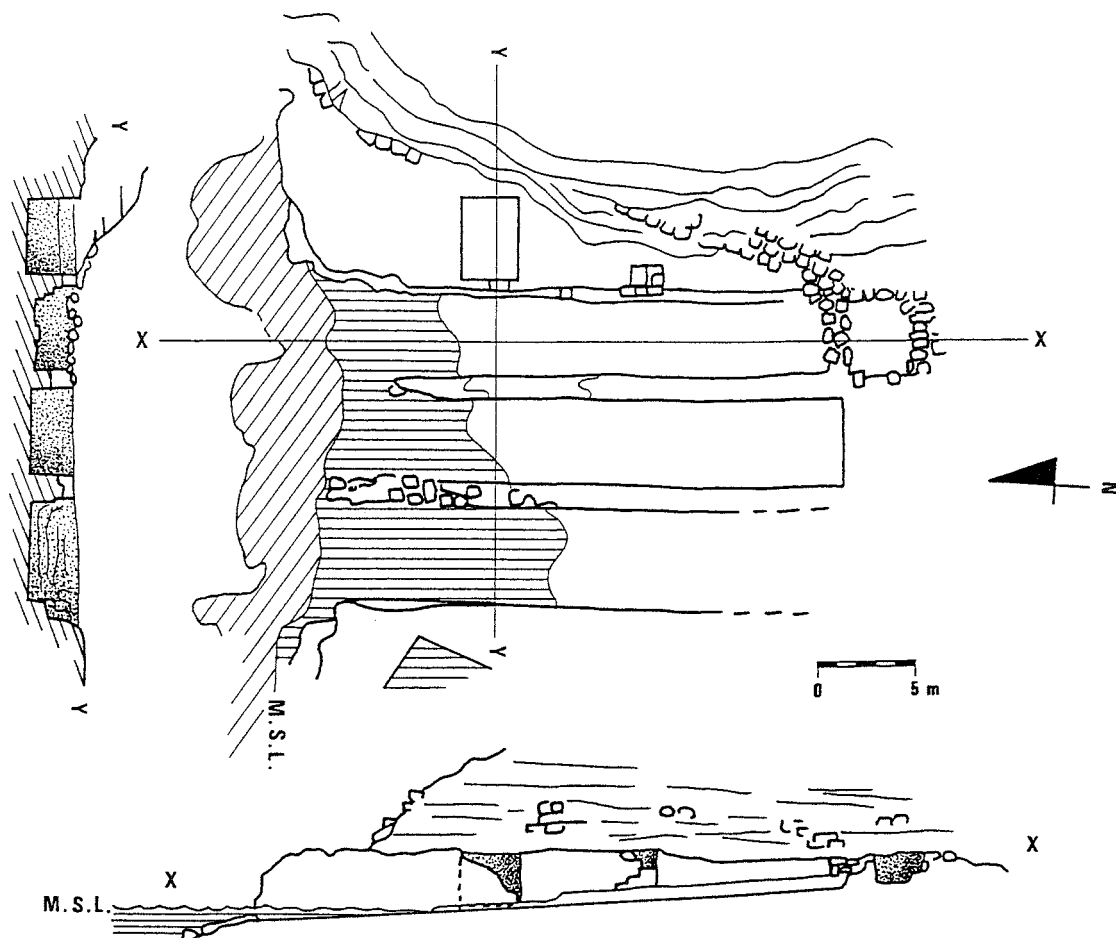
Plan and sections of Dor slipways (drawing: A. Raban).
